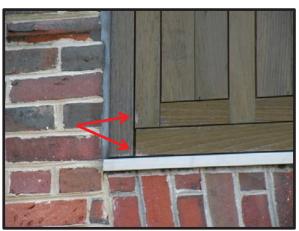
North elevation, first-floor teak fenestration unit. The arrows indicate where that the treatment has begun to fail.
